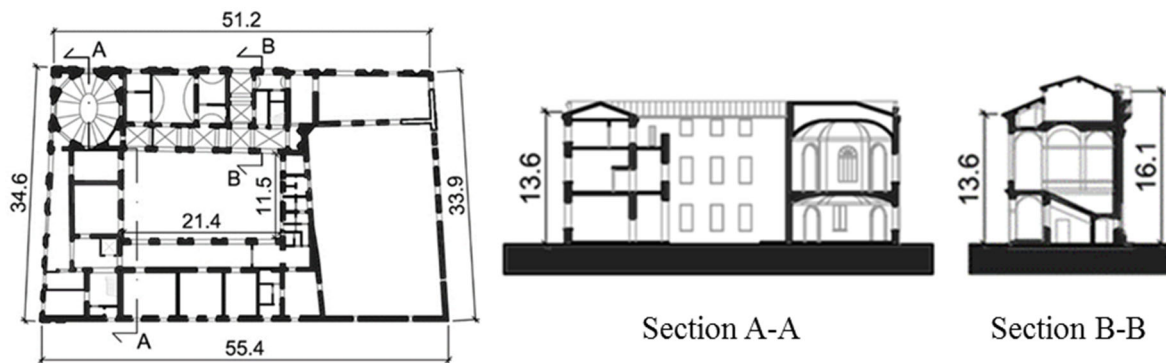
Palazzo dell'Accademia: plan, two sections and indication of the main geometrical dimensions.
